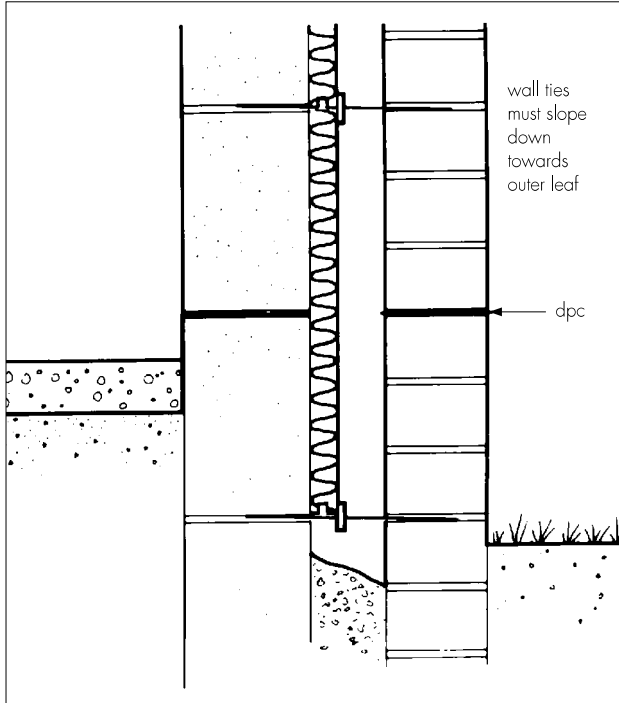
Lite Pac installed below dpc level to provide edge insulation for floor
